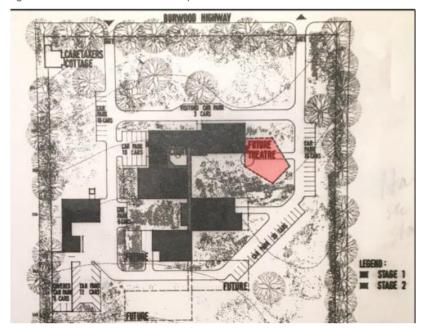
1970 site plan for the ARRB complex showing the building layout and projected future development. Source: State Library of Victoria Manuscripts Collection.
